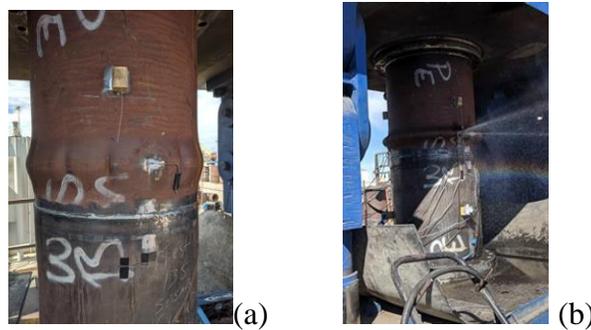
(a) Deformed shape of axially-loaded AC5-BD-SR specimen; (b) failure of AC5-BD-SR specimen.
